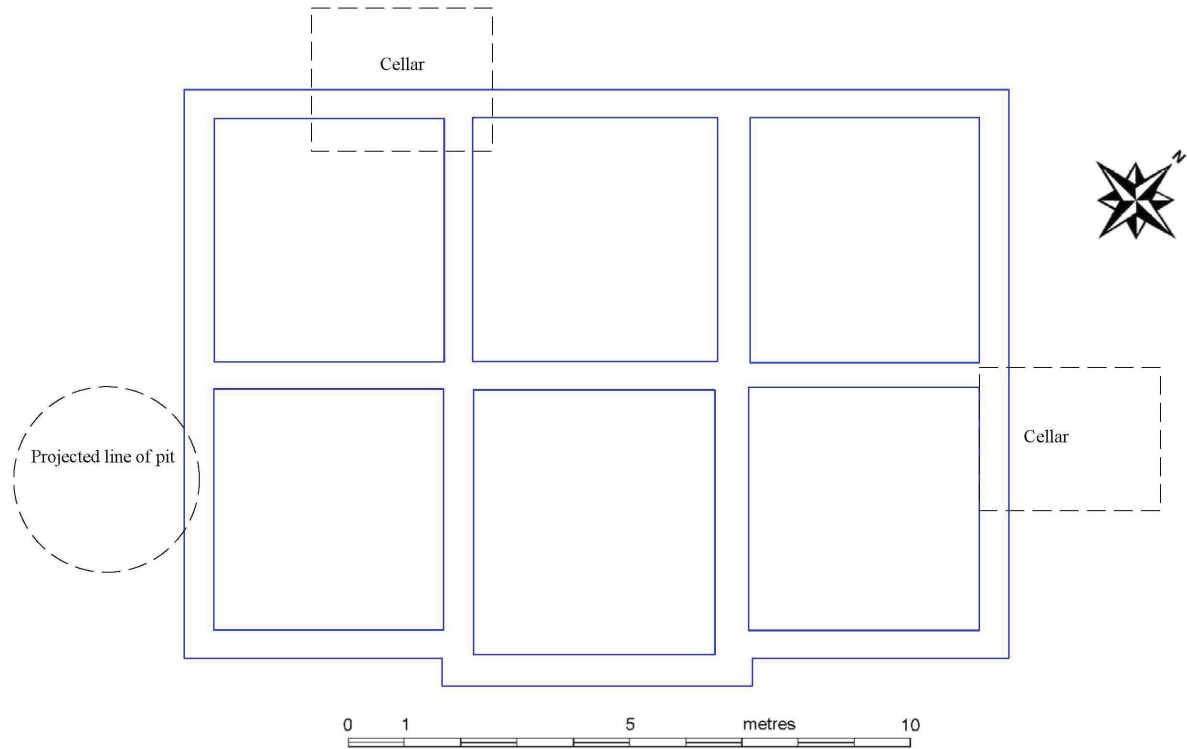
Plan of foundation trenches showing cellars and possible pit (Scale 1:100)
